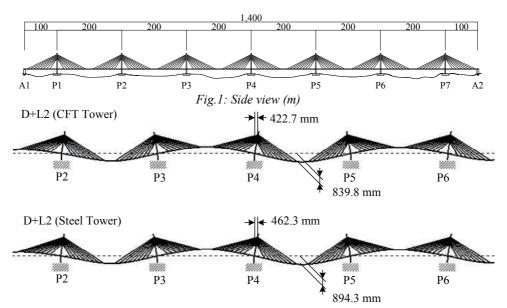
Deformation of towers and girder due to D+L2 (2000%)
